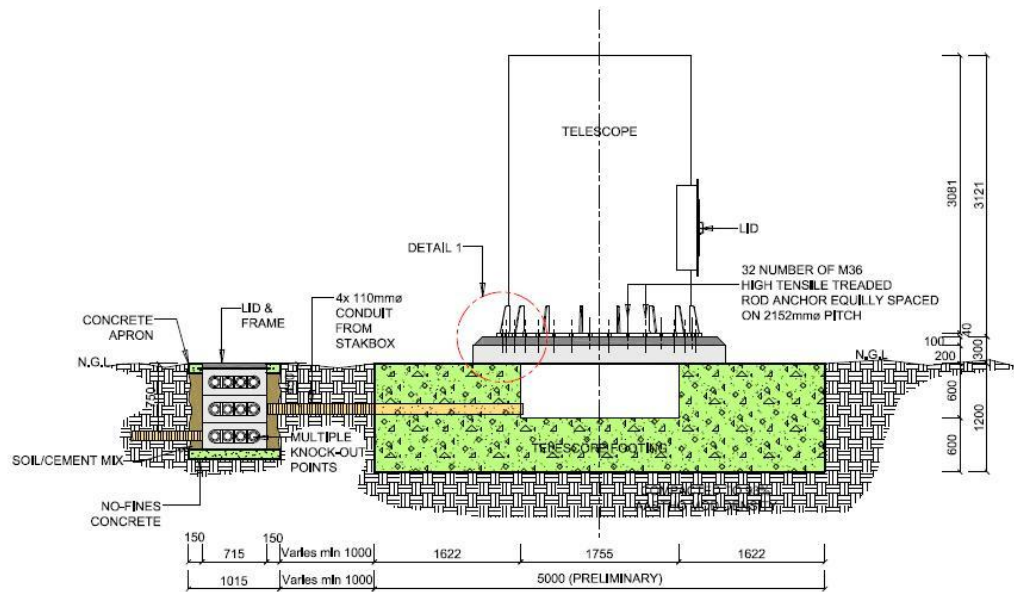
SA SKA design drawing with detail on the KAT-7 base. The pedestal is elevated onto a concrete lip to allow levelling at the construction phase. The structure is then effectively lifted from ground level by 32 bolts.
